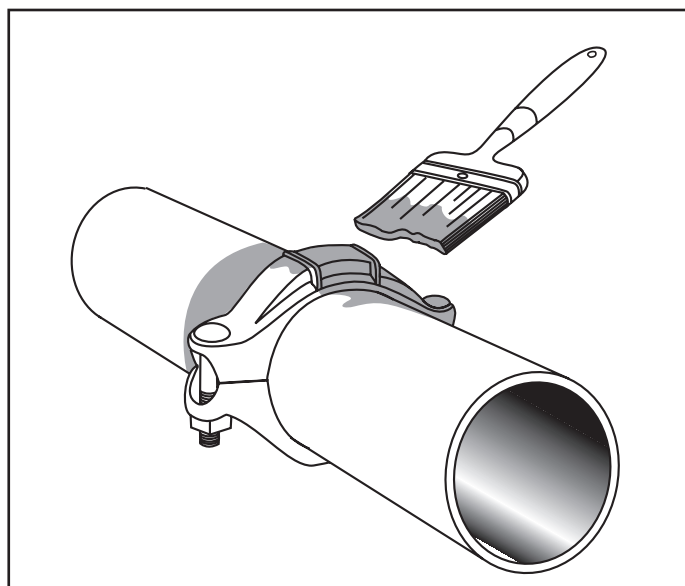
Priming flanges and couplings. Apply PREMPASTE to entire area to be wrapped with tape.
